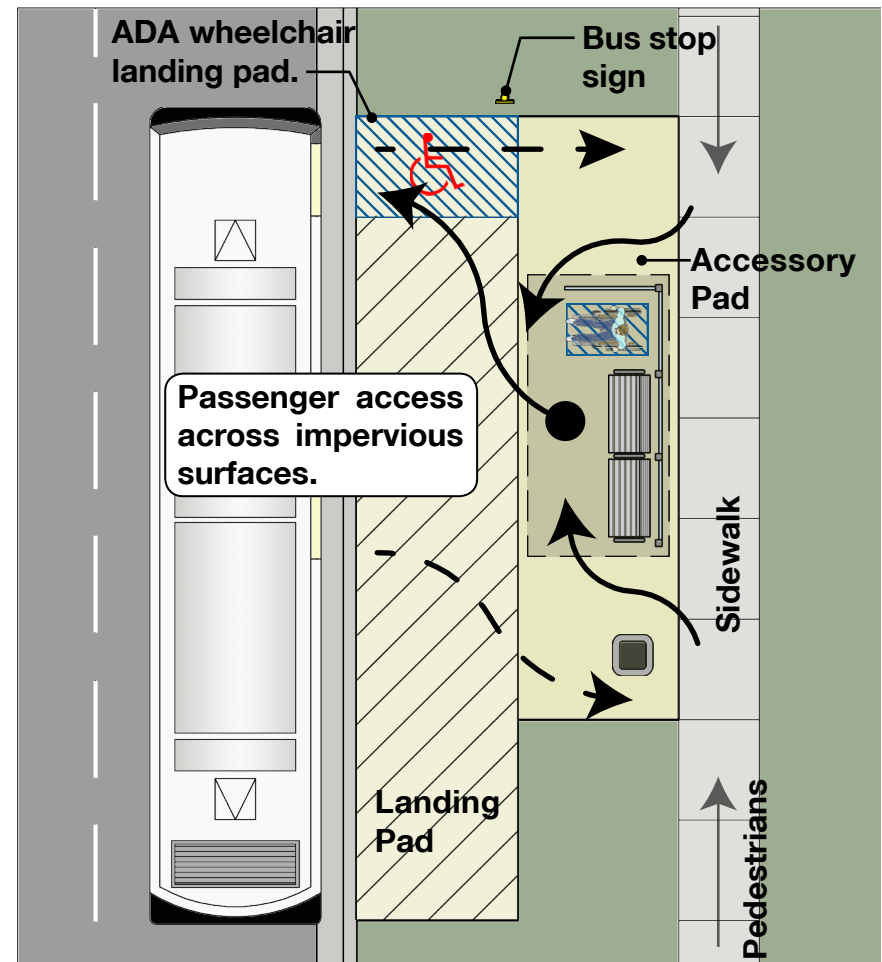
Connection to Sidewalk - Amenities in Front
